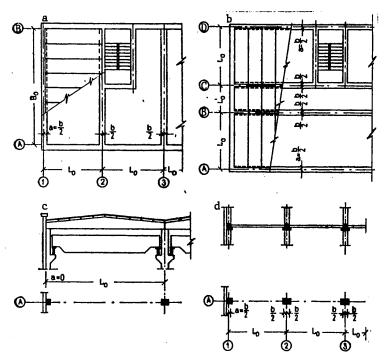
Examples of tie-in of bearing, self-supporting or hanging walls and columns to the modular layout center lines. In buildings with transverse bearing walls; b--in buildings with longitudinal bearing walls; c--in one-story frame buildings; d--in multistory frame buildings.
